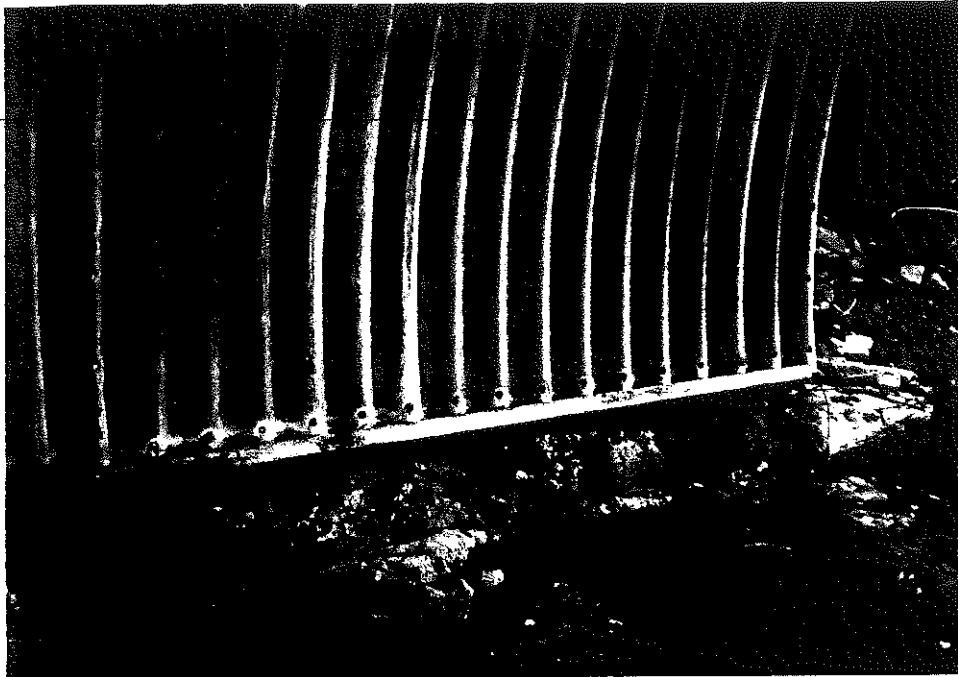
Severely Eroded Concrete Foundation, Bracken Co.
